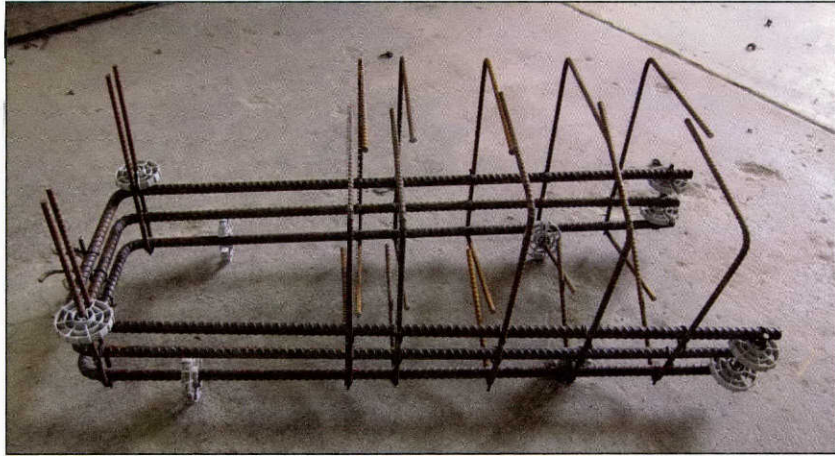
Typical steel reinforcing cage used in the larger specimens of Series 4
